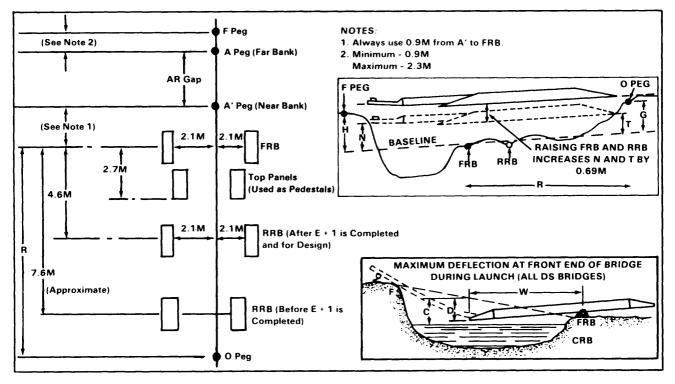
Double story MGB site layout (2E+1 through 2E+12 bays)
